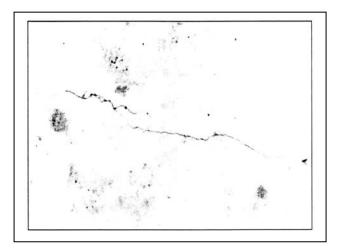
Image of a crack in a concrete structure (Paul M. Dare et al, 2003)
